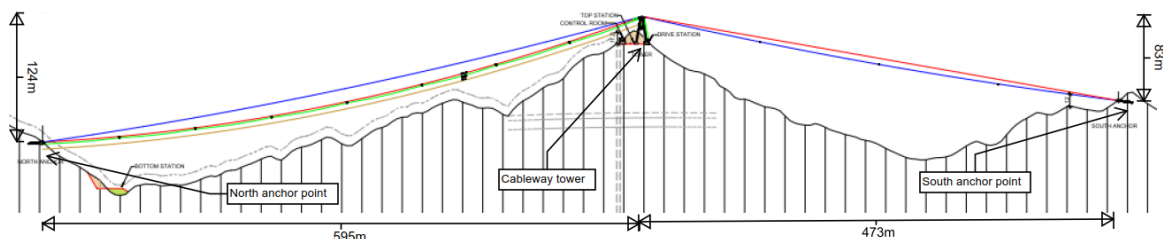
Cableway general arrangement with the north anchor block, the south anchor block and the tower.
